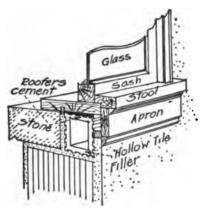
A Cut Stone Sill Used ir Connection with Hollow Tile
